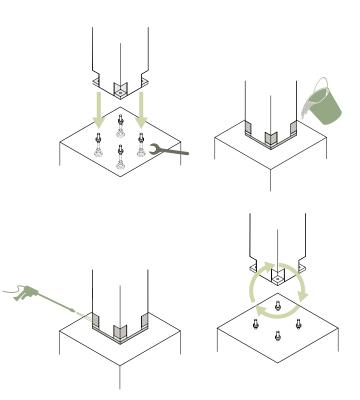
Peikko prefabricated column designed for disassembly and reuse, PEIKKO White Paper -Adapted illustration
